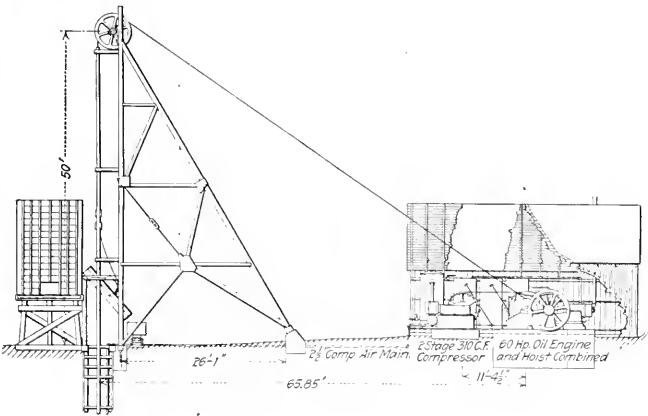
HEADFRAME AND SURFACE PLANT FOR SMALL EXPLORATORY SHAFT
